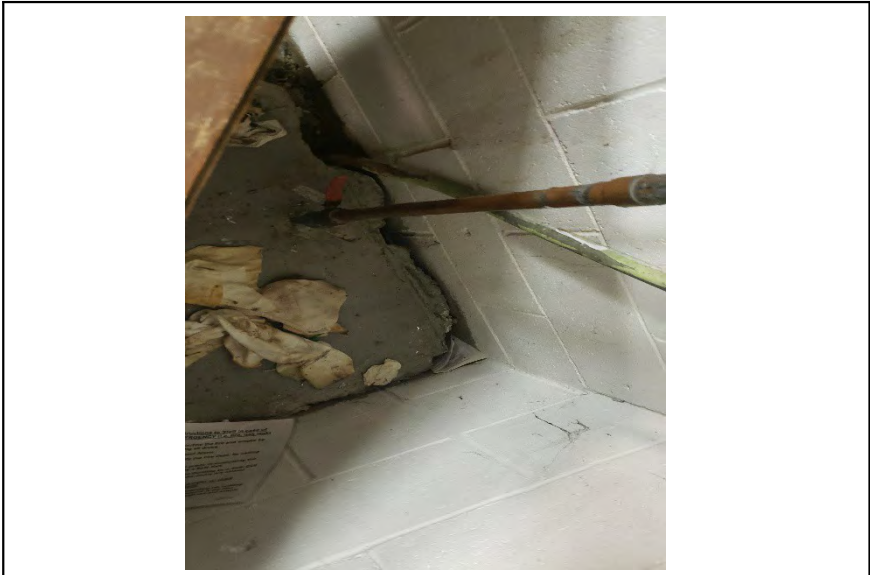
Slab-On-Grade to Wall Separation in Compressor Room
